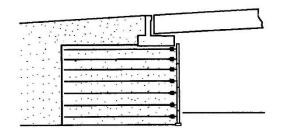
Schematic. "True" bridge abutment with continuous footing on top of a mechanically stabilized earth (MSE) wall.
